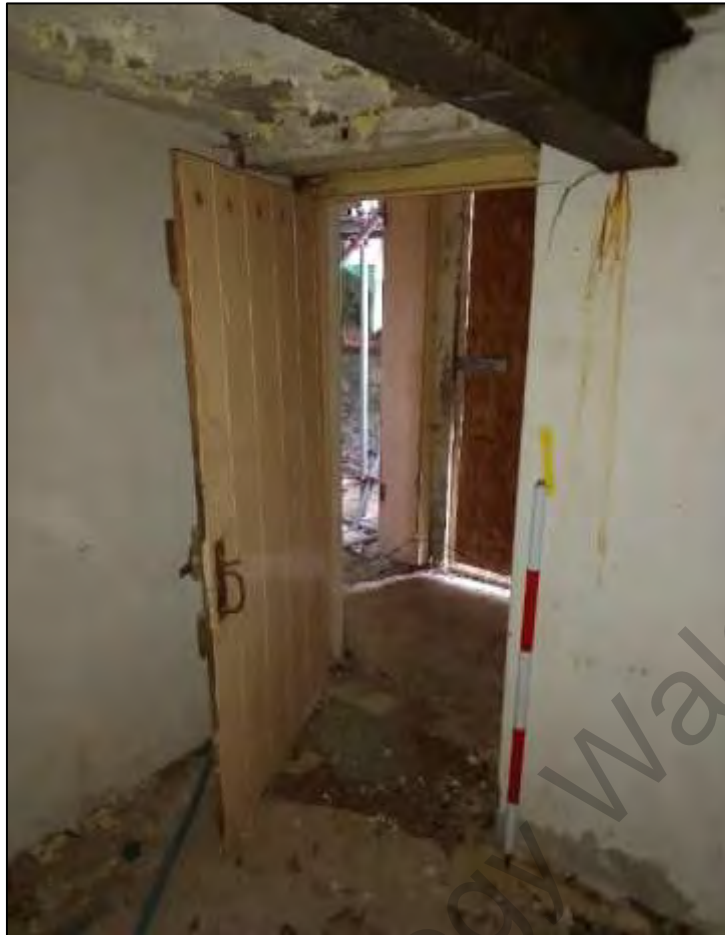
Door from Room 6 to Porch, view south-east. Scale 1m.
